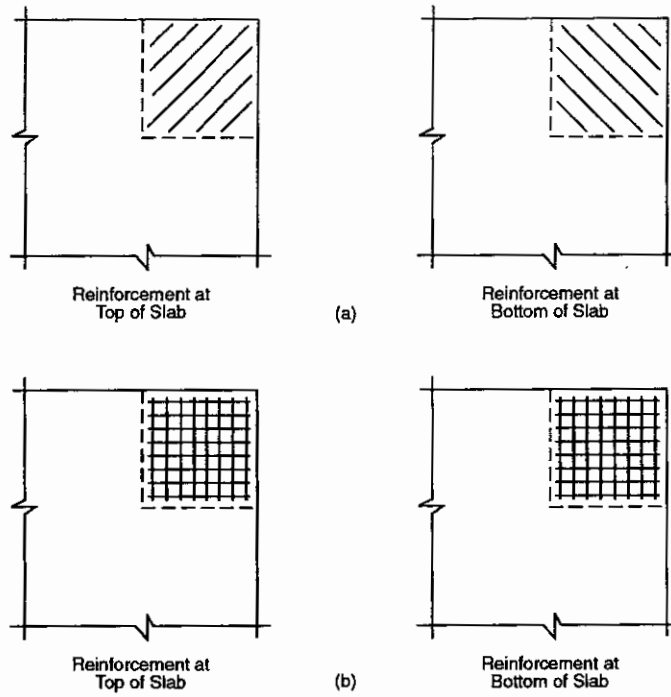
Special Reinforcement Required at Corners of Beam-Supported Slabs
